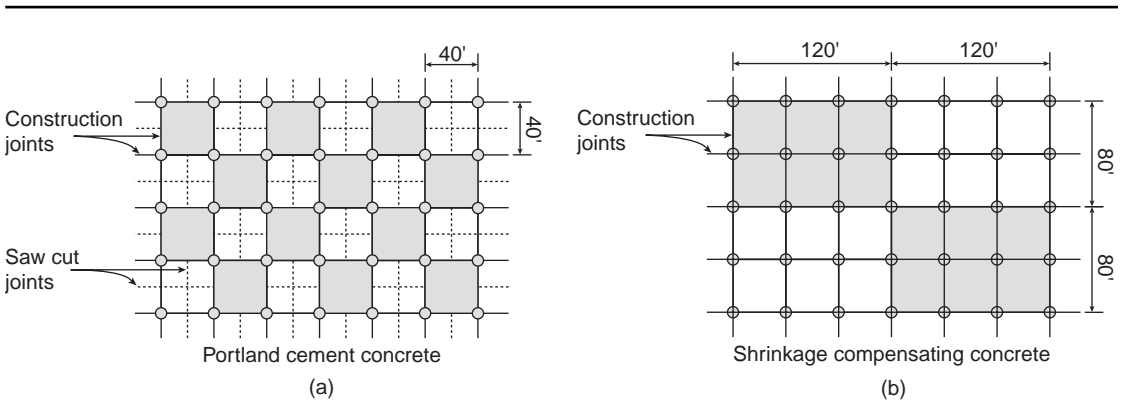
Relative proportions of constructions joints in concrete slabs made with (a) portland cement, (b) shrinkage-compensation cement. (From Hoffman, M.W., and E.G. Opbroek, *Concr. Int.*, Vol. 1, No. 3, pp. 19–25, 1979.)
